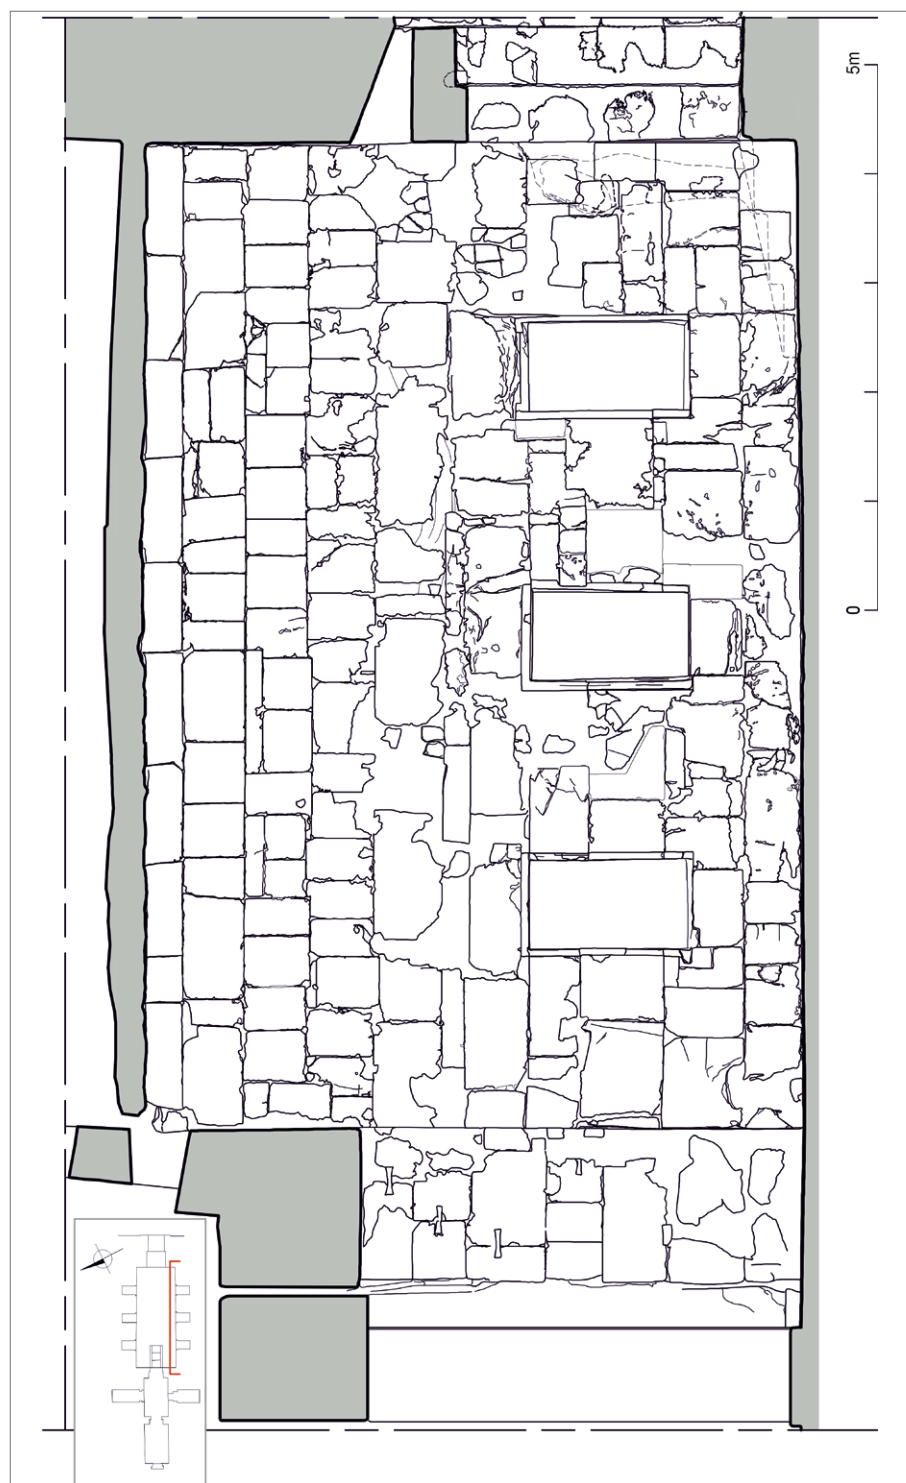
South wall of the Bark Hall: state of preservation of the structure in 2020 (PCMA UW | architectural inventory drawing U. Krasniewska)
